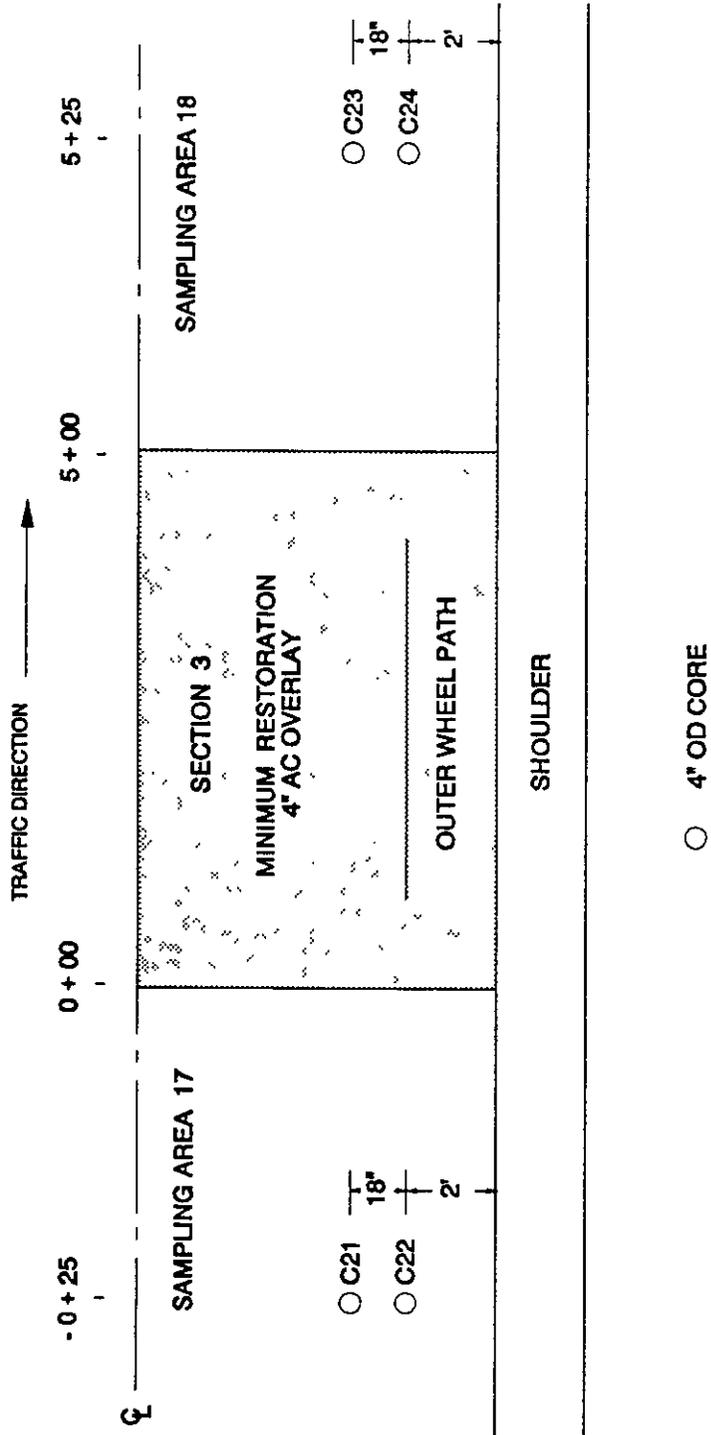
Example of "Post-Construction" Sampling Plan for Test Section 3
